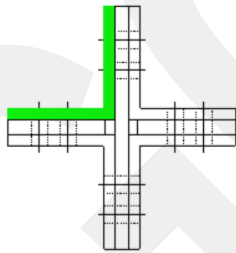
Bending on lower main member 1 (Specimen-3)
